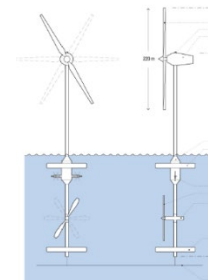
Spar-buoy type foundation proposed by Raisanen [29]
